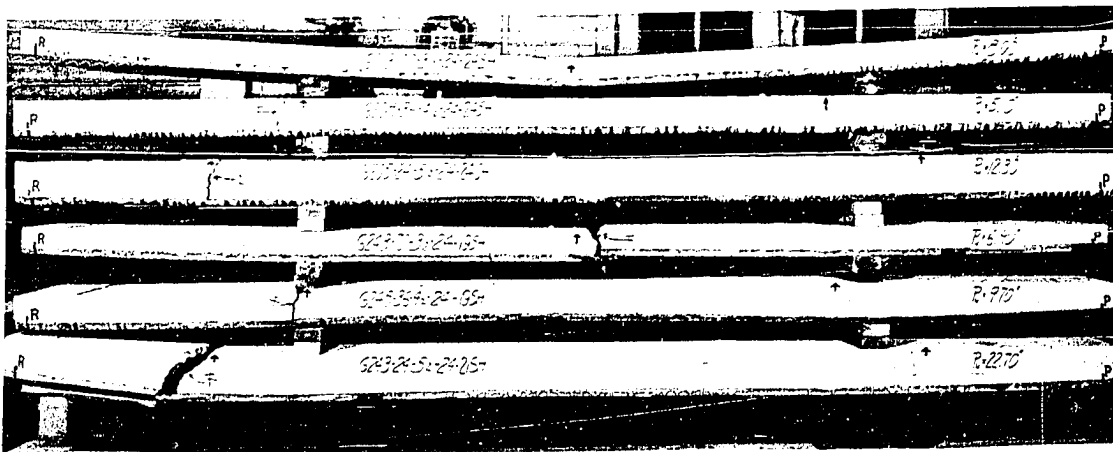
Typical shear-bond and flexure failures of beams constructed with deck G-20 and 24 gage. Each beam was approximately 28 inches wide and 12 feet in length with variable depths
